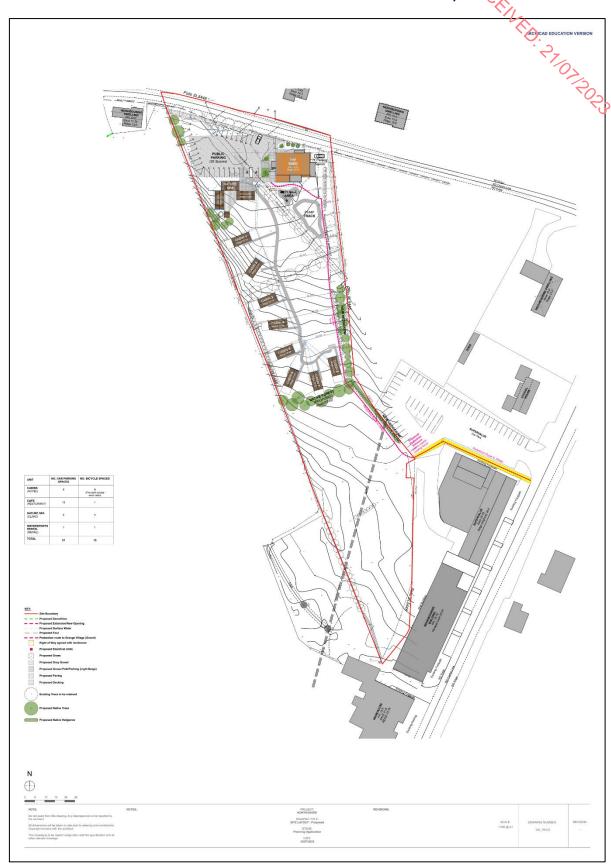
Proposed Site Layout Plan (Source: Architect for Project)
